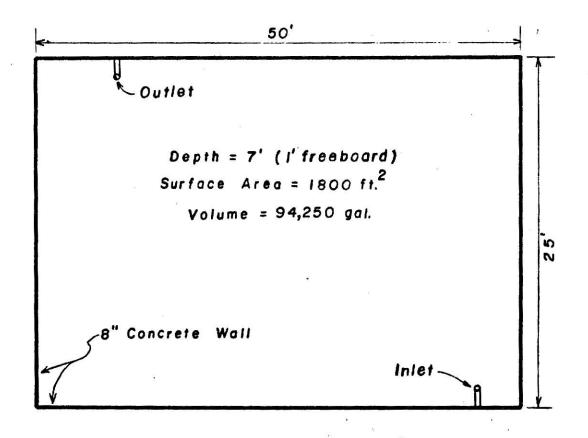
PLAN OF WALNUT GROVE POLISHING POND
